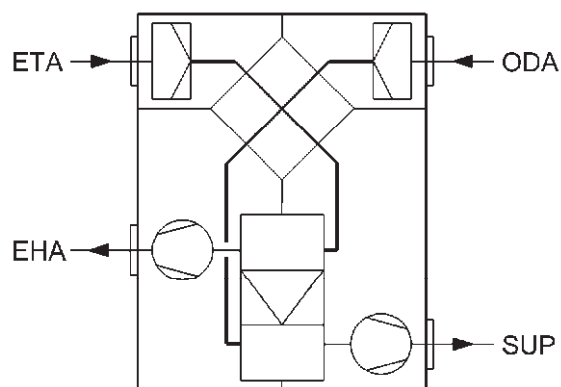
Example of Air handling unit with exhaust air/supply air heat exchanger and exhaust air-to-supply air heat pump
